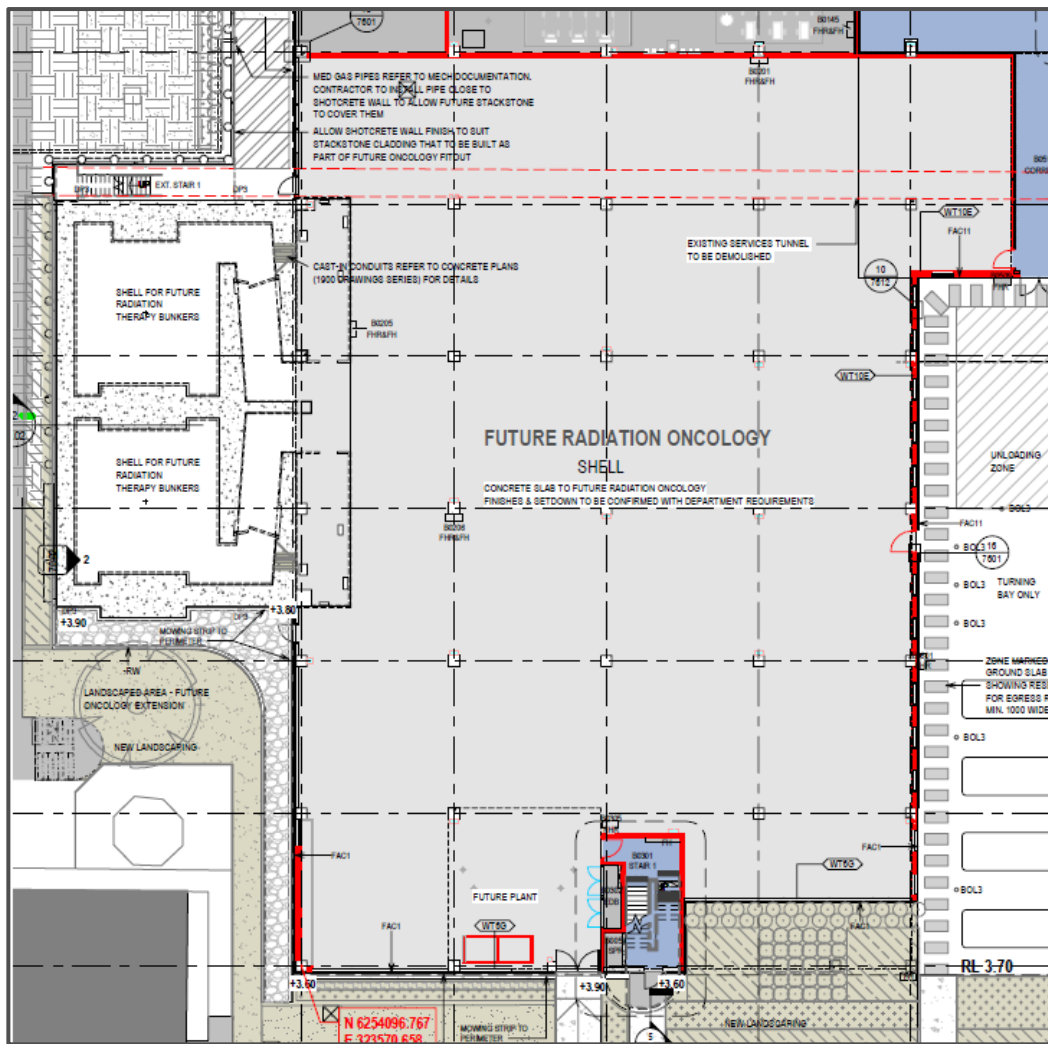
| Approved basement shell space (Source: Applicant's Modification Request)
